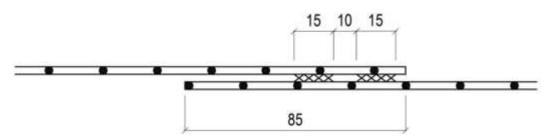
A double-track hot-air weld made with an automatic welding machine
